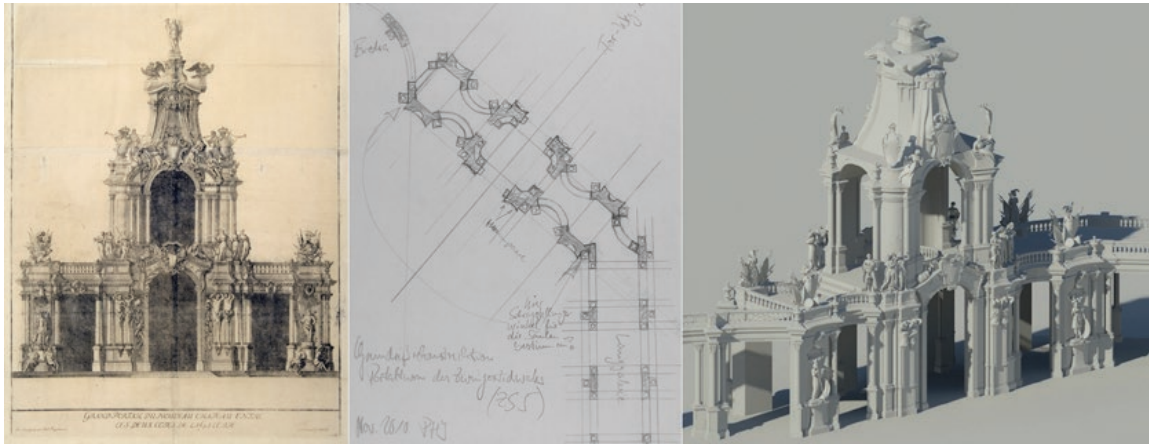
From elevation (copperplate from 1729) via a sketched reconstruction of the ground plan (2010) to the virtual model (2010-11), exemplified by a gateway tower of time-cut no. 5 (cf. above fig. 9).
